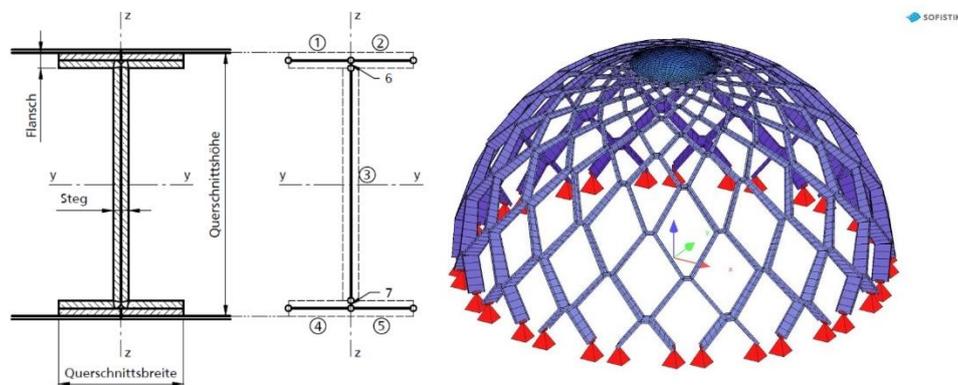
2 Model details of the rib structure in SOFiSTiK (Werth, 2015b)
